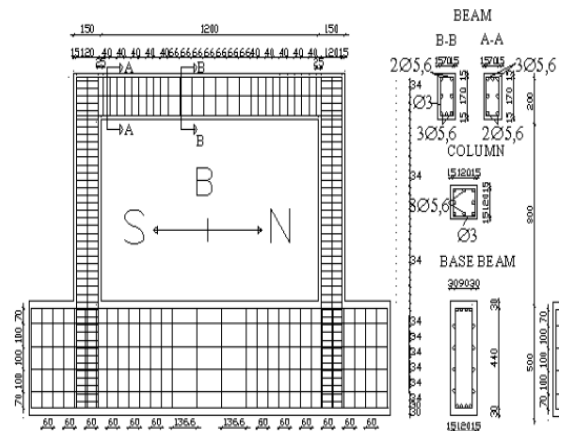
Reinforcement detailing of the reinforced concrete (RC) frame model (mm)
